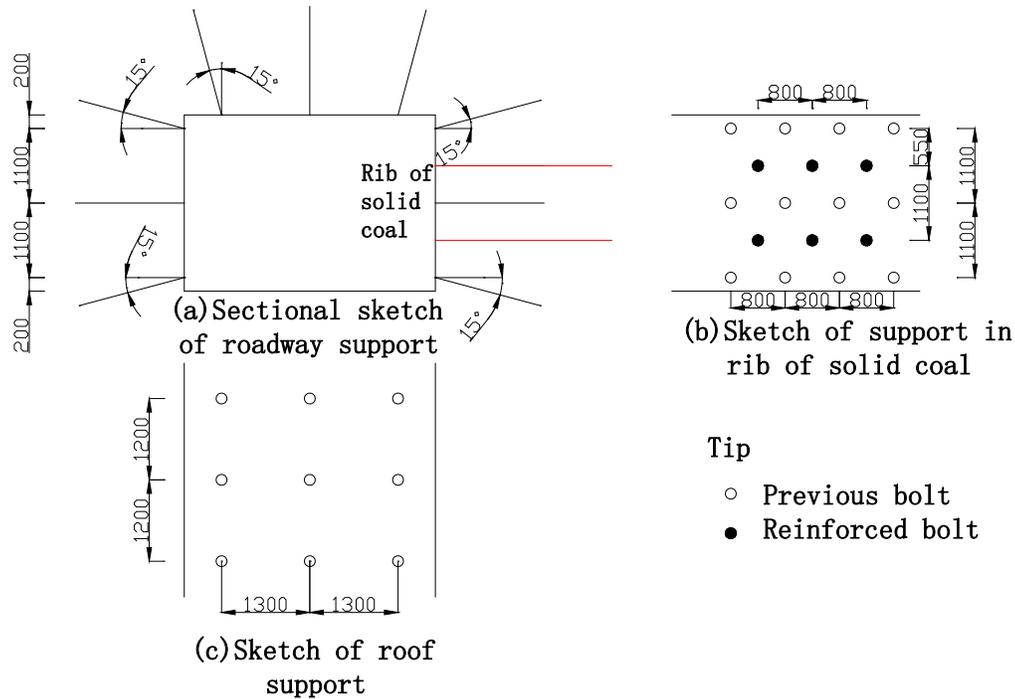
Bolting support sketch after reinforcement (unit: mm)
